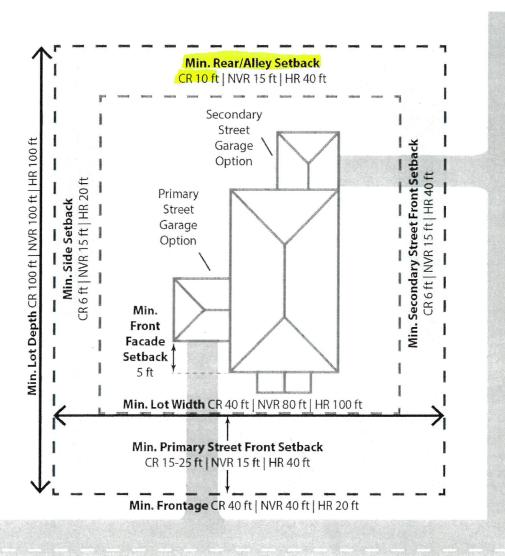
CR, NVR, and HR Spatial Requirements- Single-Family Dwellings
